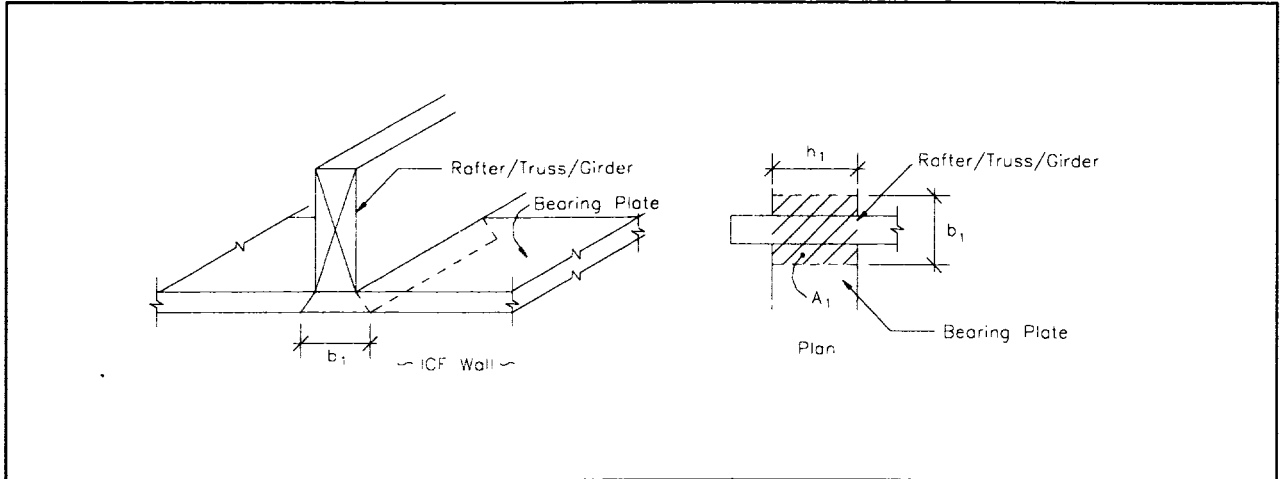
Design Variables Defined for Bolted Sill Plate Bearing on ICF Wall
